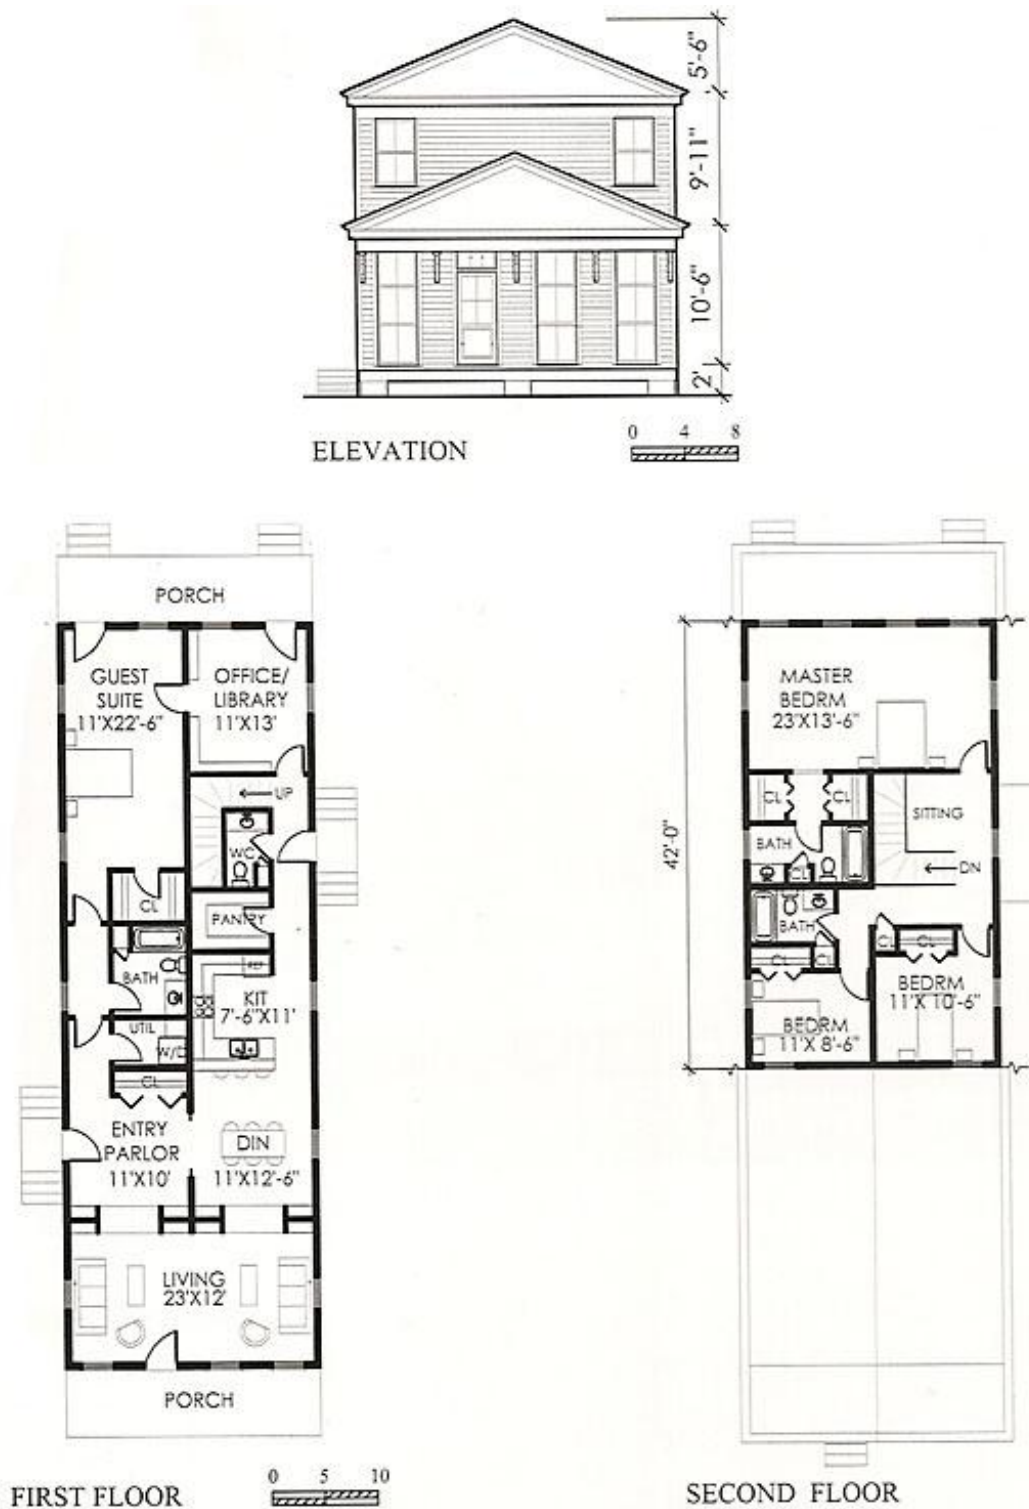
Example of a standard, traditional four-bay single barrel, camelback shotgun house in plan and elevation from Roulhac Toledano's *A Pattern Book of New Orleans Architecture*.
